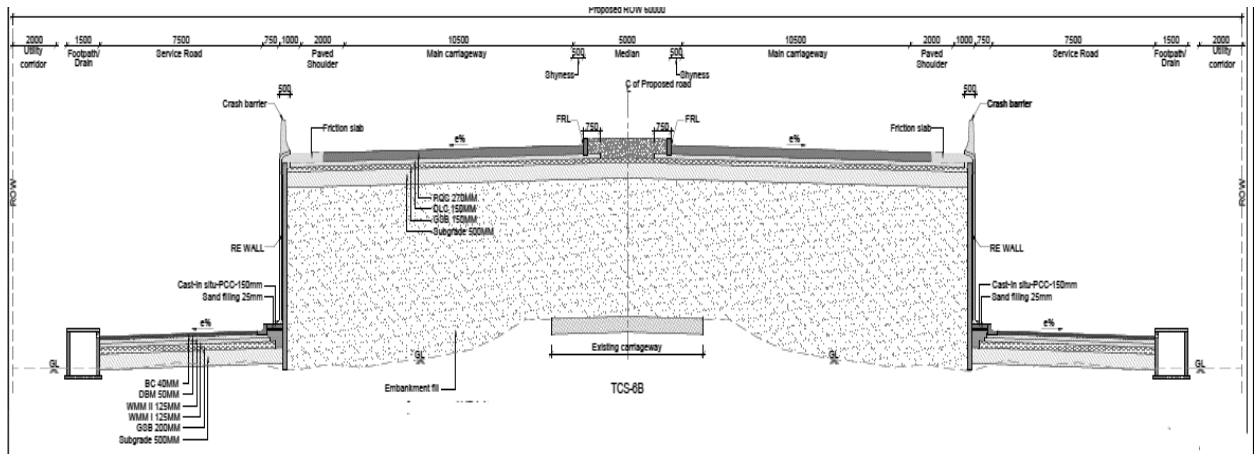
(TCS-6B) 4 Lane Underpass Cross Section With Service Roads In The Existing Road
